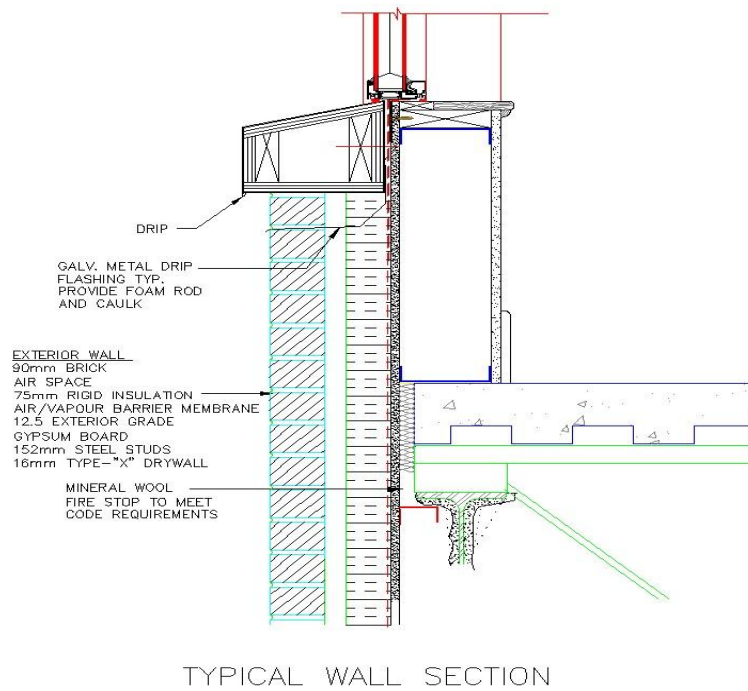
The typical wall section for Building X was well detailed, implementing PERSIST
